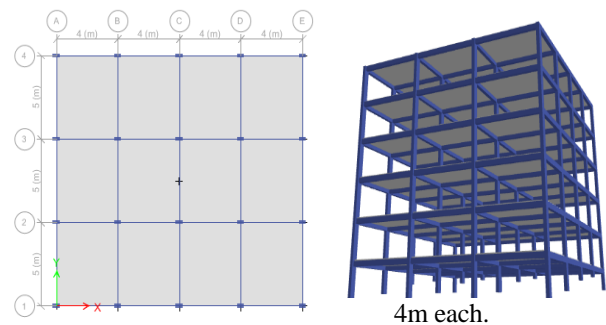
Typical Plan and 3D view of Model-2 of 4 x 3 bays bare frame.
